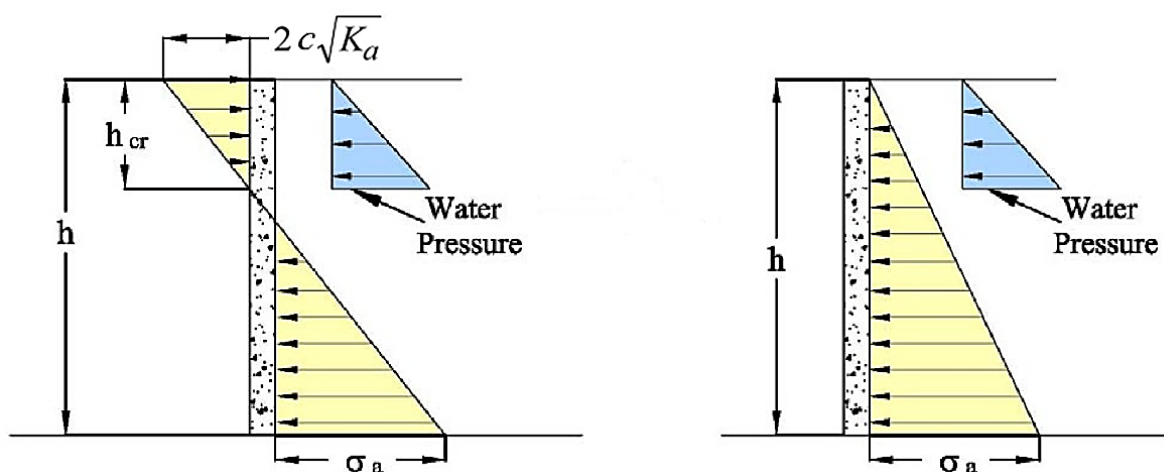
Pressure Diagram Depicting Hydrostatic Water Pressure in the Tension Crack Zone
